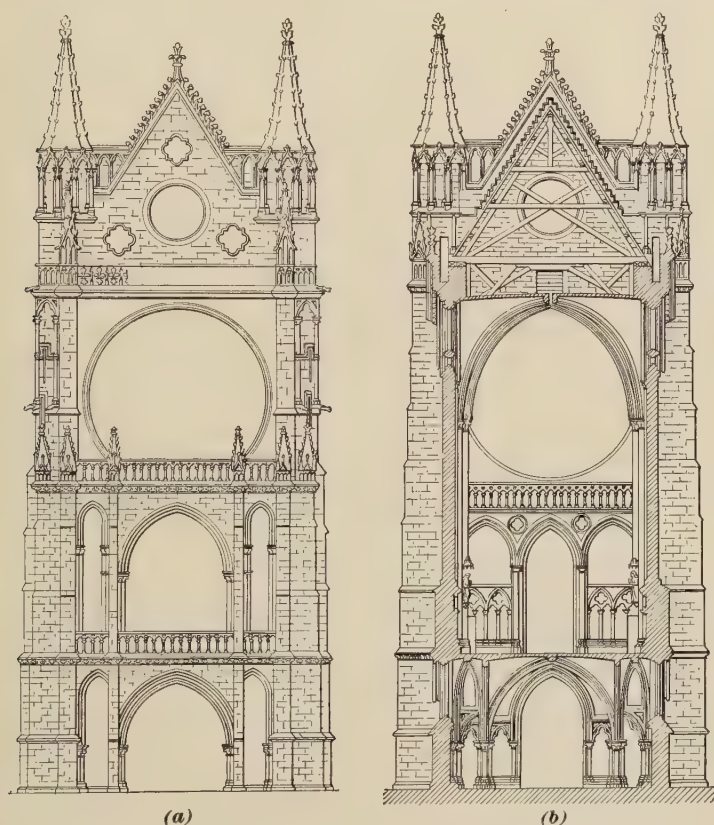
ELEVATION AND TRANSVERSE SECTION OF SAINTE CHAPELLE, PARIS
